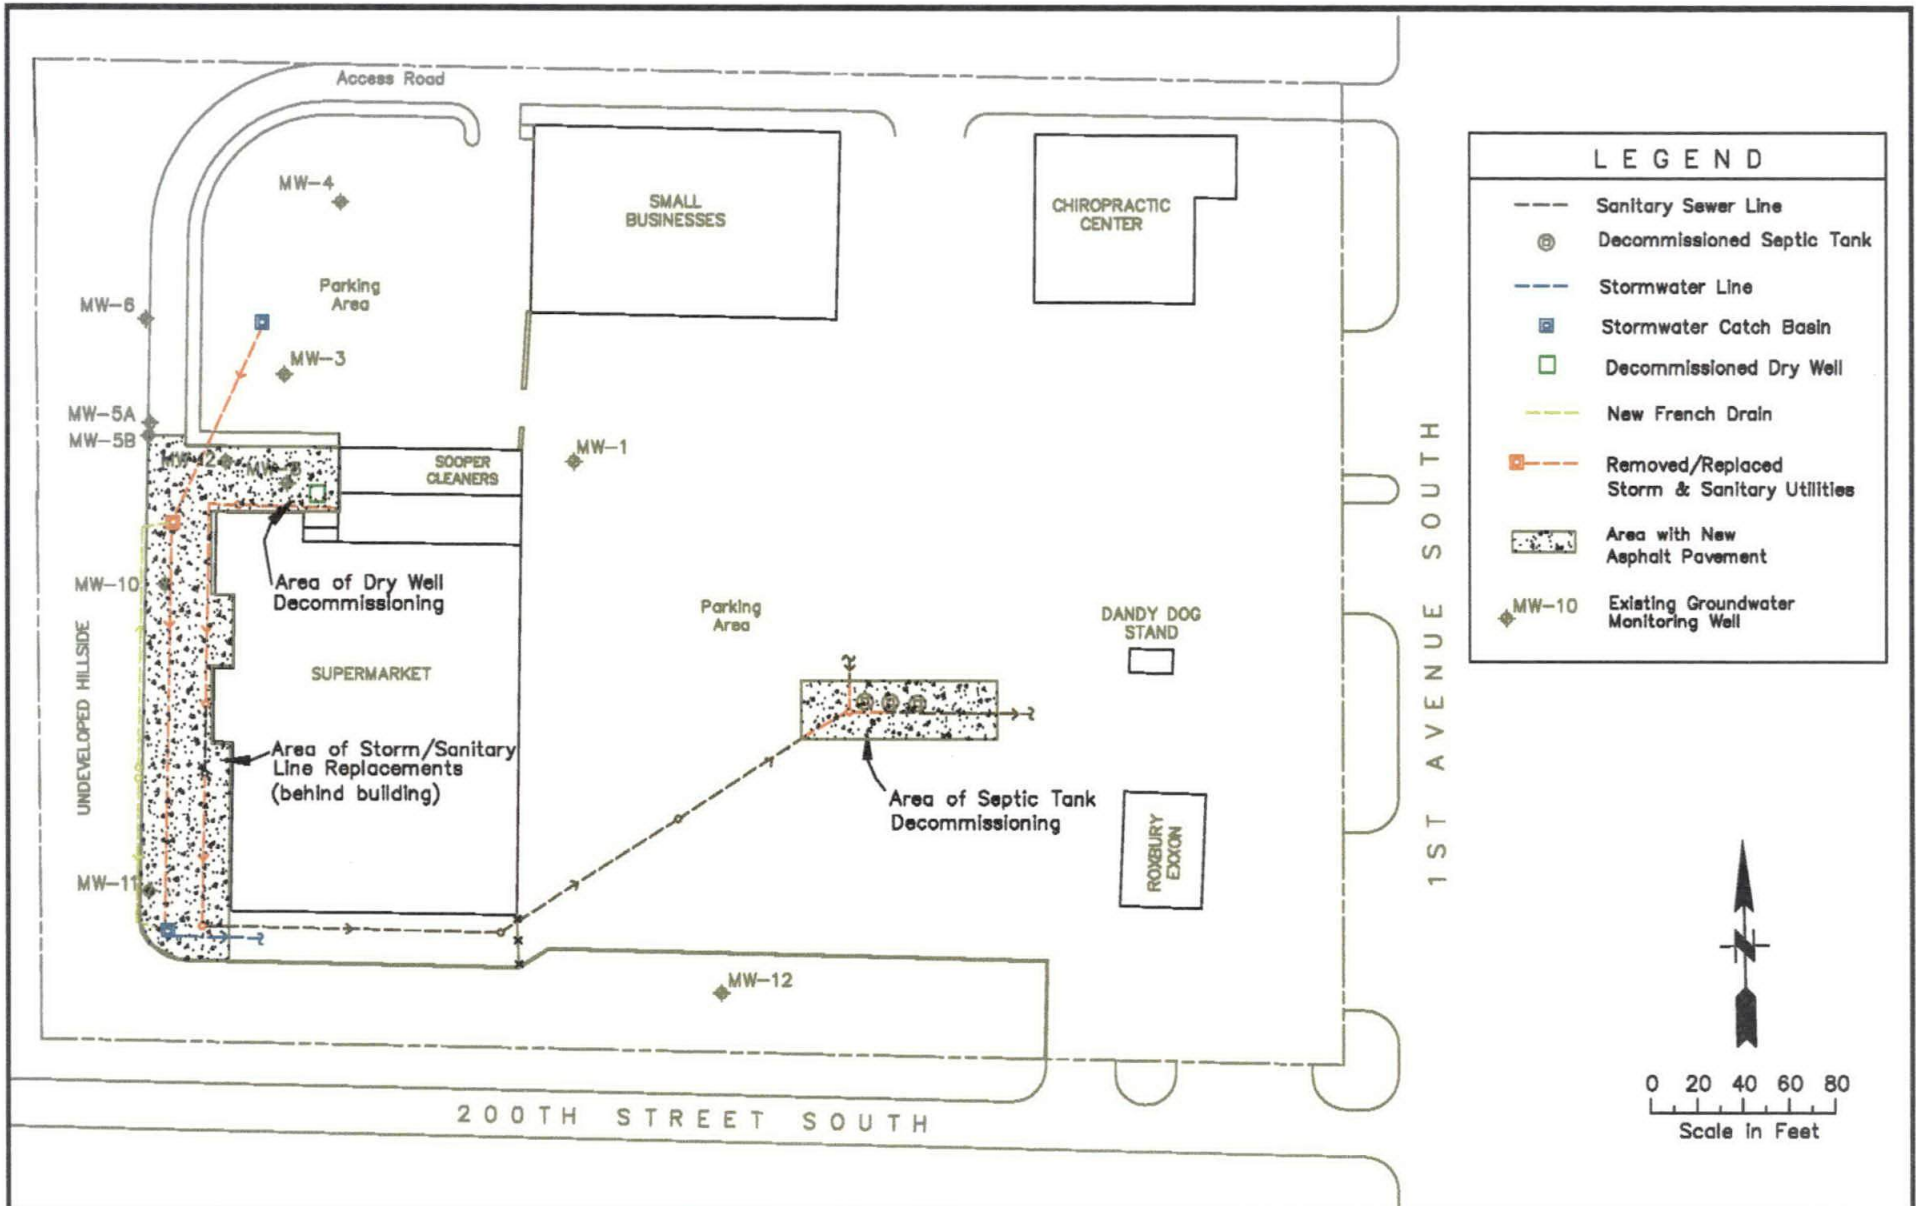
shows the general layout for the engineered site controls installed at the shopping center as part of the soil cleanup activities.
